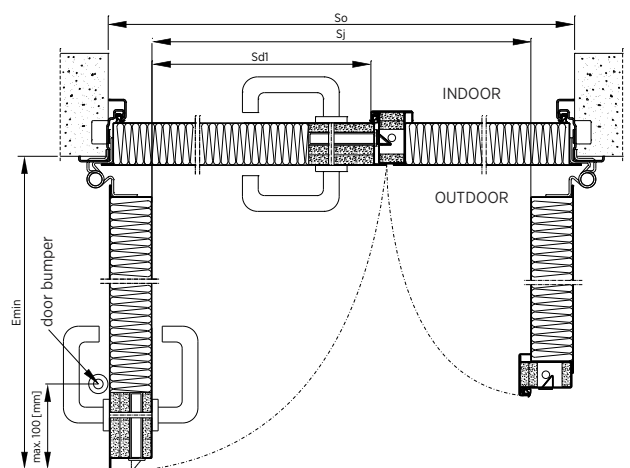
Installation of the double-leaf door with the corner frame, horizontal cross-section
